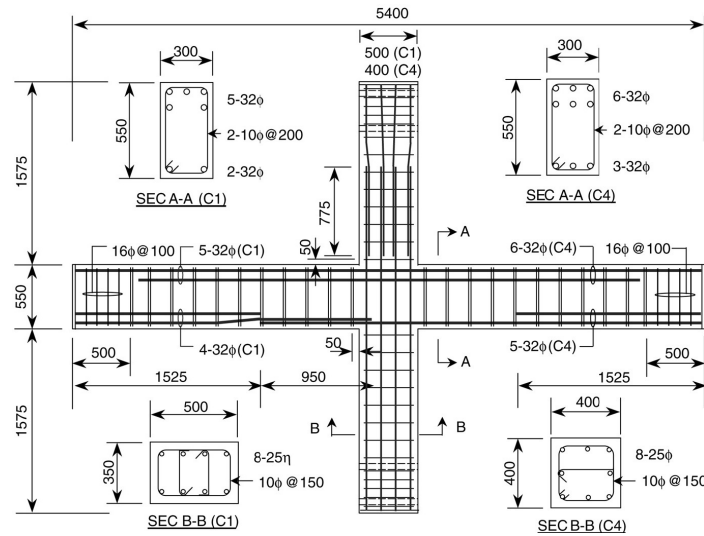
Details of beam-column joints tested by Dhakal et al. (2005)
